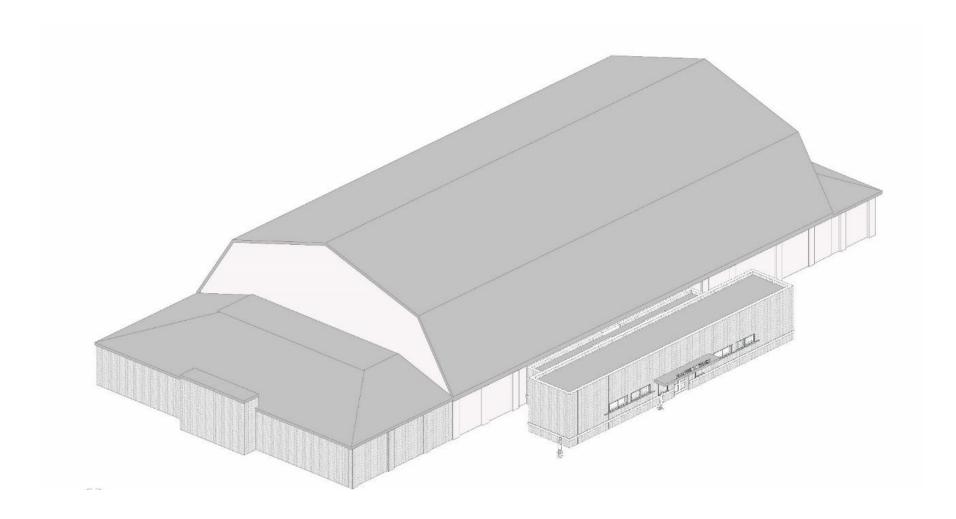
Overall massing showing Hipel roof of heritage arena, single storey north entry pavilion and new west side addition.
